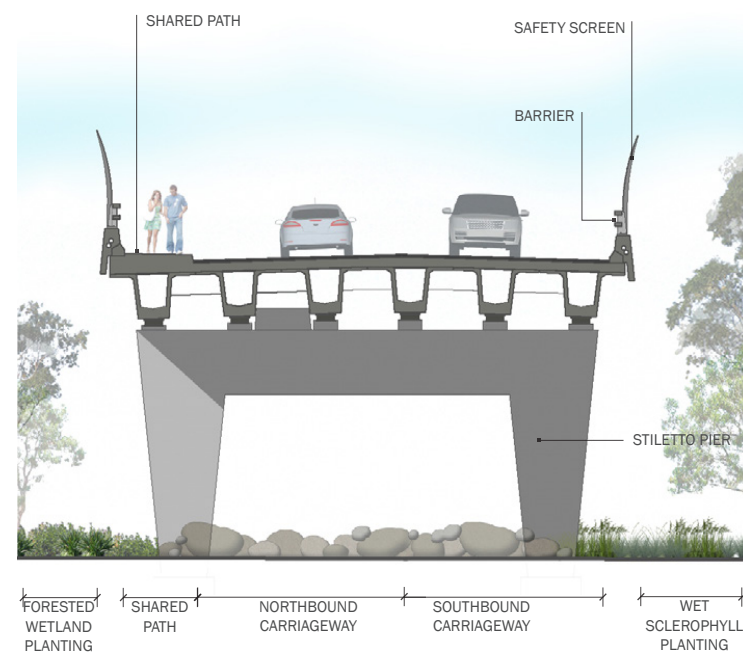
Typical cross section of overpass bridges (Scale 1:200)
